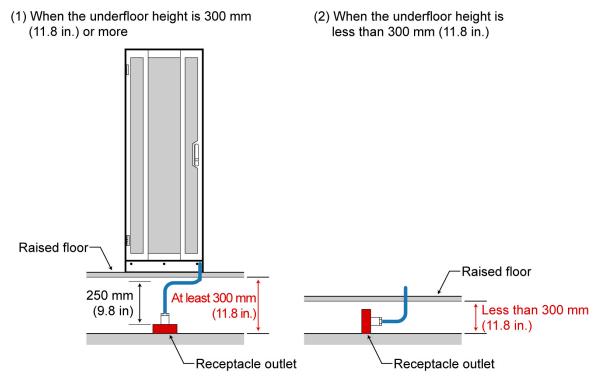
Power cable connections under a raised floor (except in Europe)
